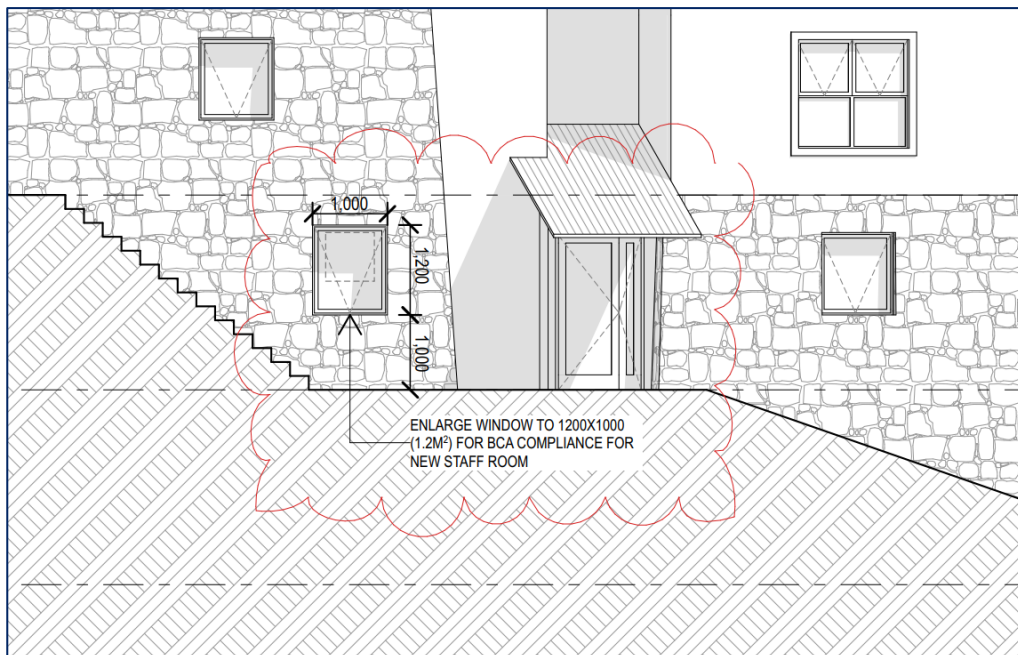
| Level 1 window enlargement on east facing façade for new location of bedroom for staff accommodation, within the building (Source: Applicant's documentation)
